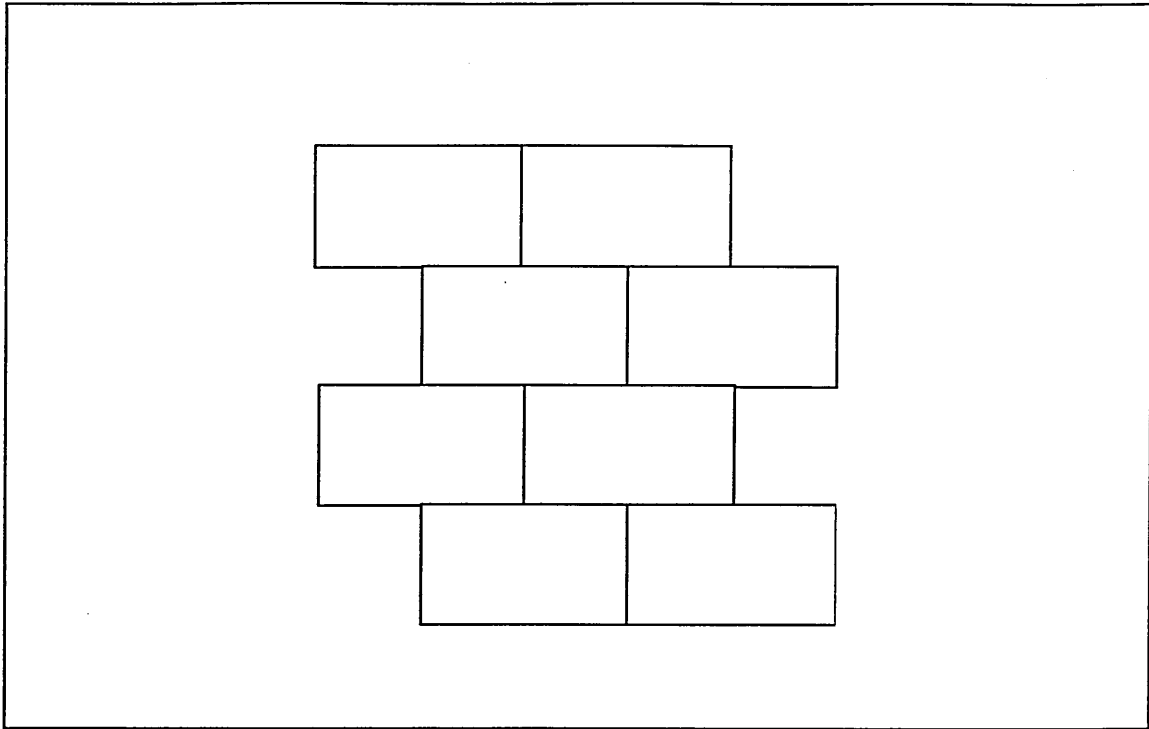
; arrangement of flooring sections for impact sound insulation test.
